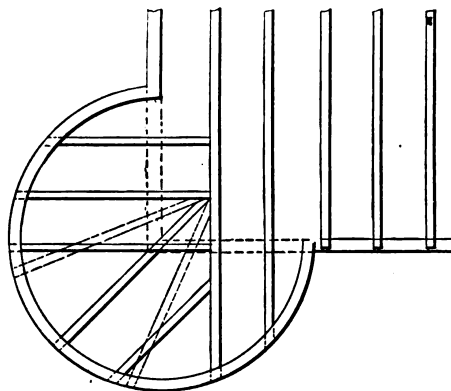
Imperfect Form of Floor Construction.—Scale, 1/4 Inch to the Foot.
